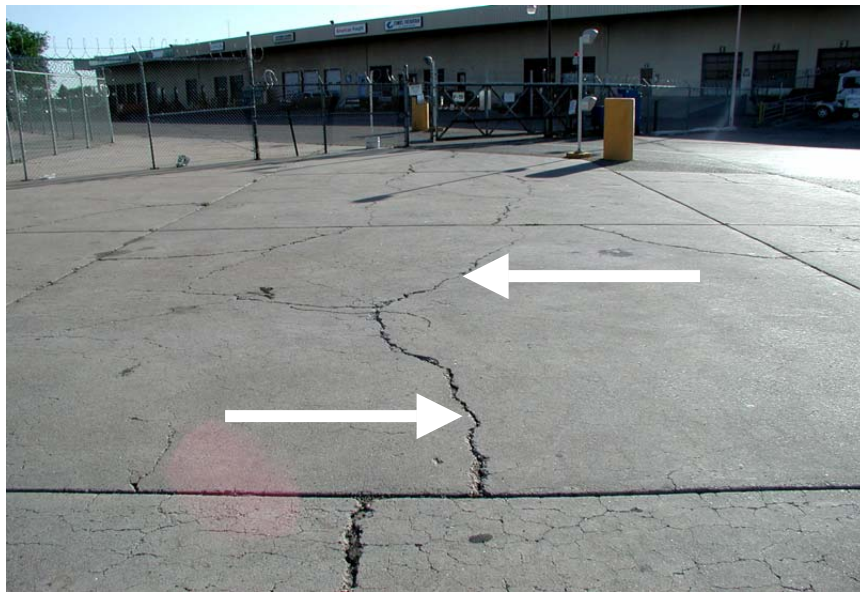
Longitudinal cracks (→) in an airfield pavement.
